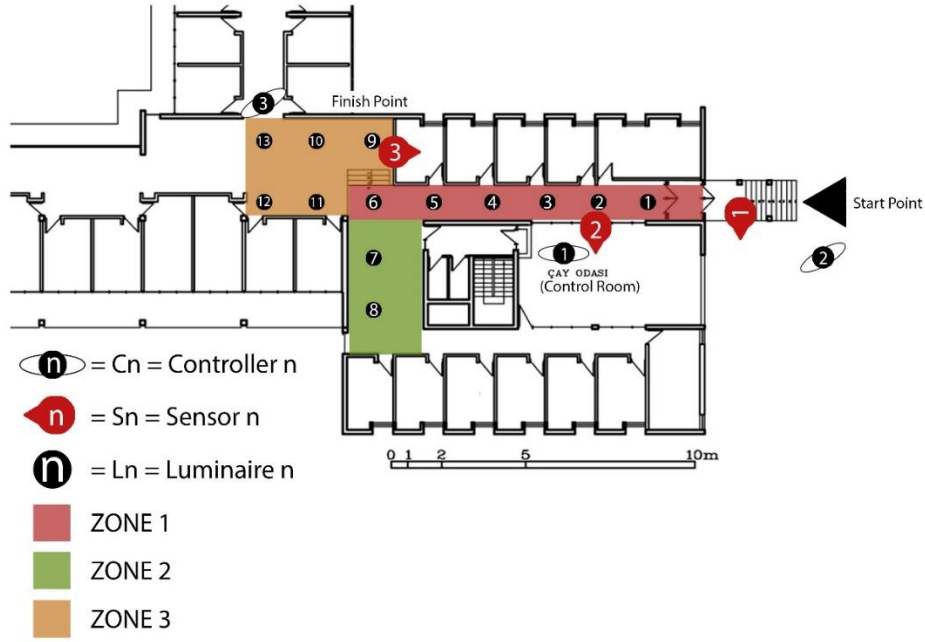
Plan denoting the location of zones, luminaires, sensors and controllers.
